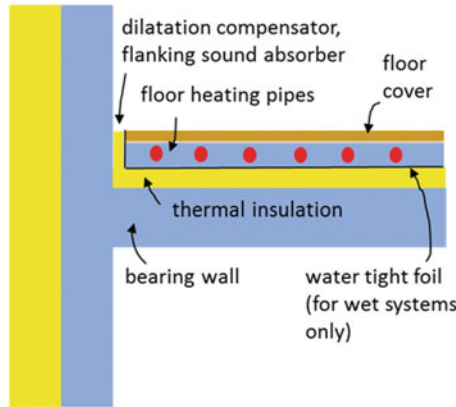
Cross-section of structure with integrated floor heating pipe register
